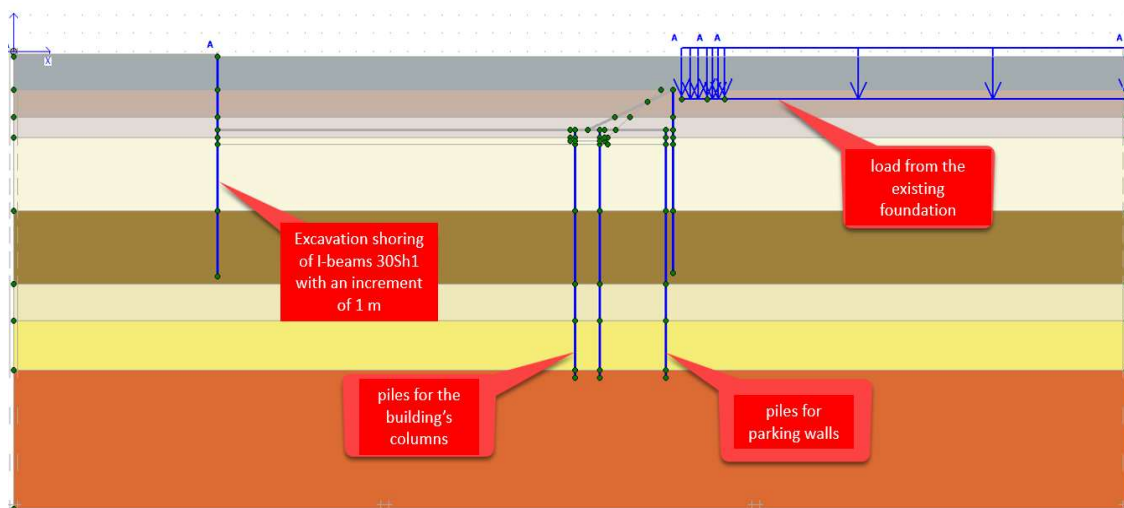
Stage 1 of the excavation shoring erection in section 1-1
